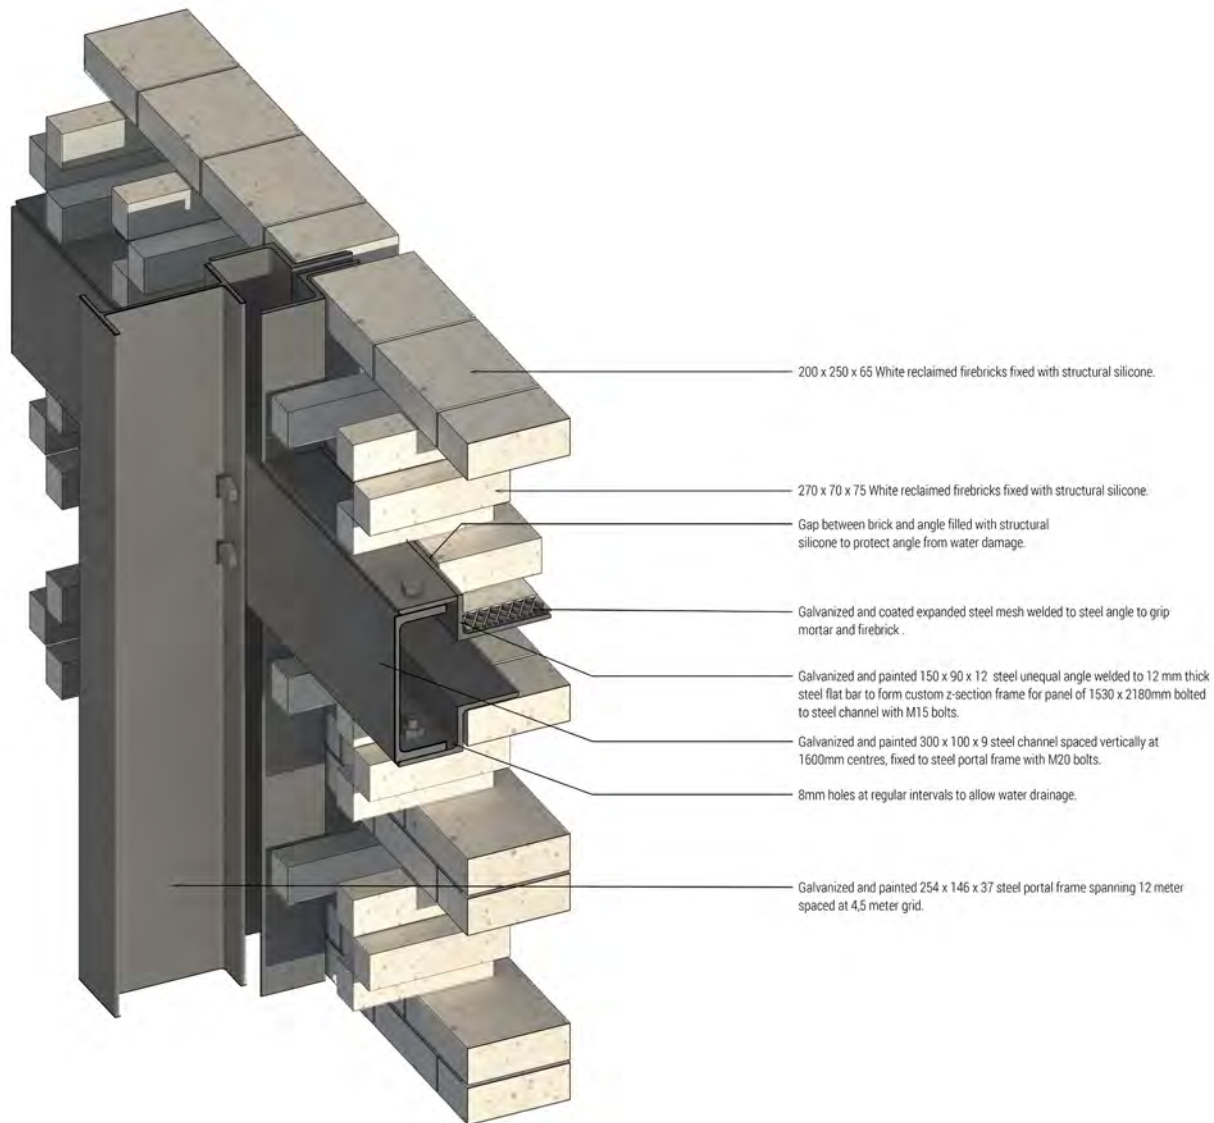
Three-dimensional detail of fire brick screen panel construction (Author, 2017).
